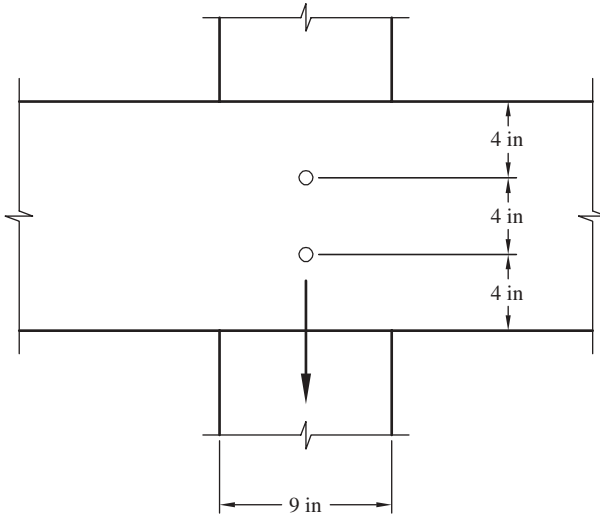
Single-shear connection, beam to column—Example 13.2.4-1.
